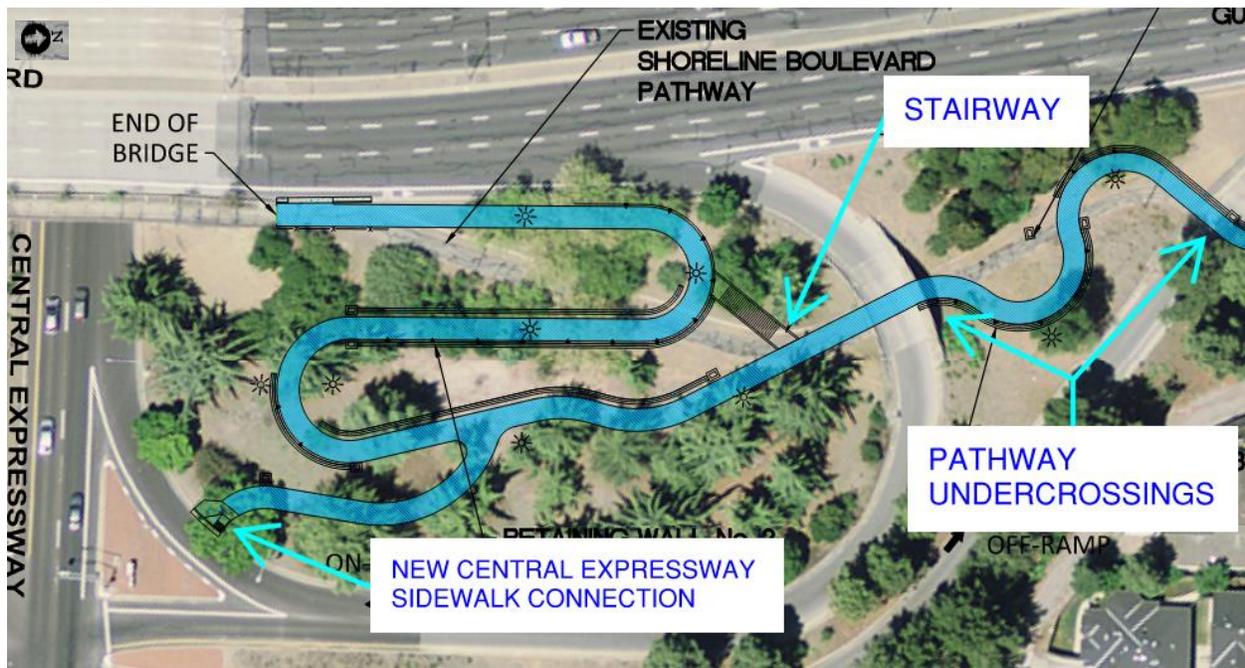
Shoreline Boulevard Overpass Structure to Northbound Shoreline Boulevard/Central Expressway On-Ramp
